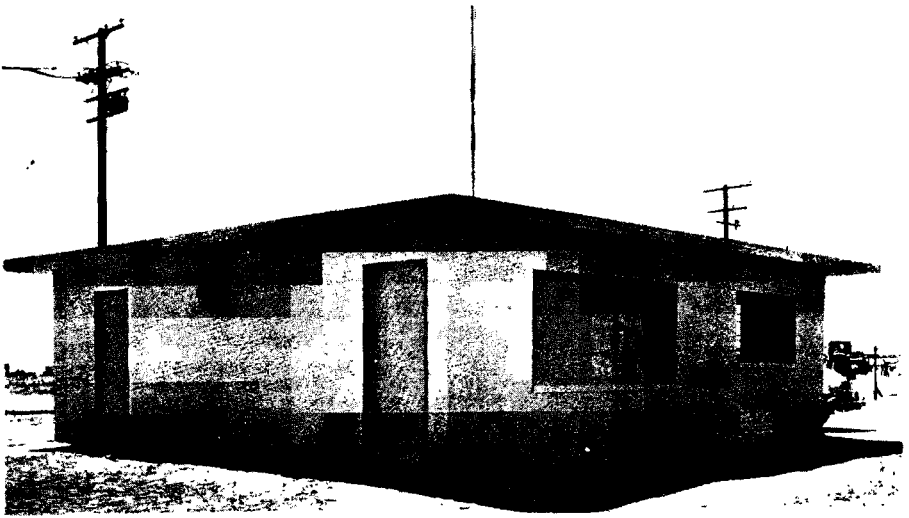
Reinforced masonry-block house before a nuclear explosion, Nevada Test Site.
